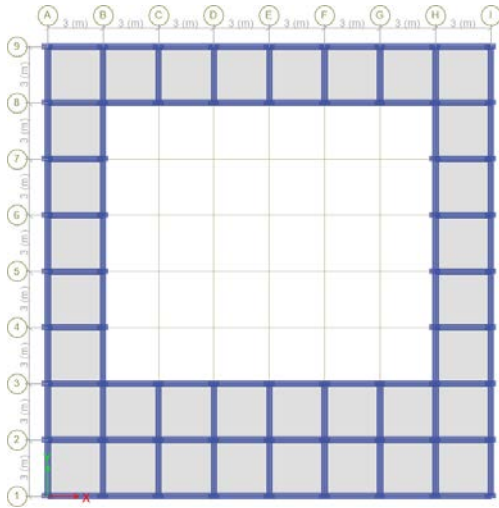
Plan of model 1<sup>st</sup> AB<sub>2</sub>
